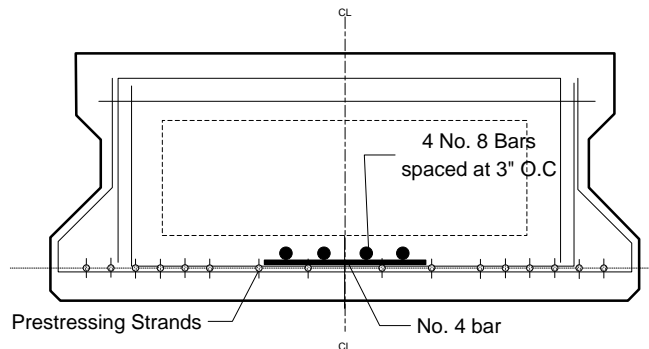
Beam 4B20#3 section showing tension reinforcements
